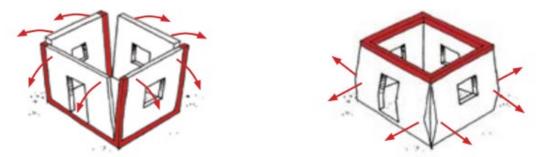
Walls of a simple building are not prevented from falling by columns alone. Roof-level ring or tie beams can tie the building together. (From Guide book for building earthquake resistant houses in confined masonry (World Housing Encyclopedia, 2018).
